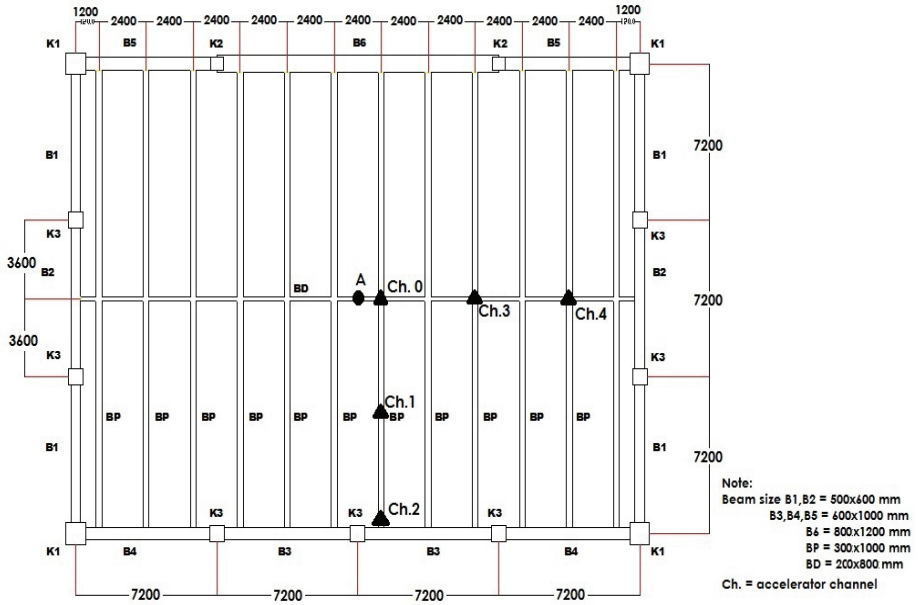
The beam - slab layout and dimension of the second floor of Grha Sabha Pramana [1,2]
